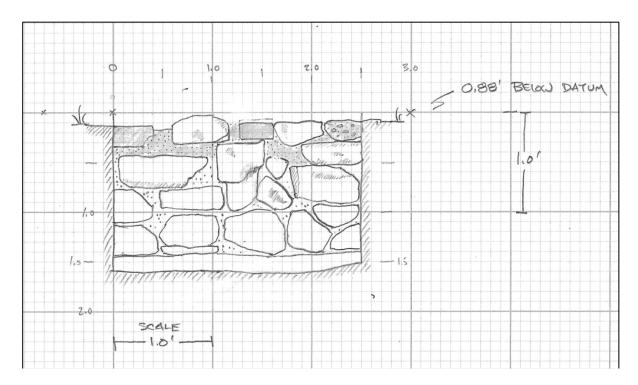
Elevation of north face of Feature 1 wall foundation; looking south; bricks are shaded.
